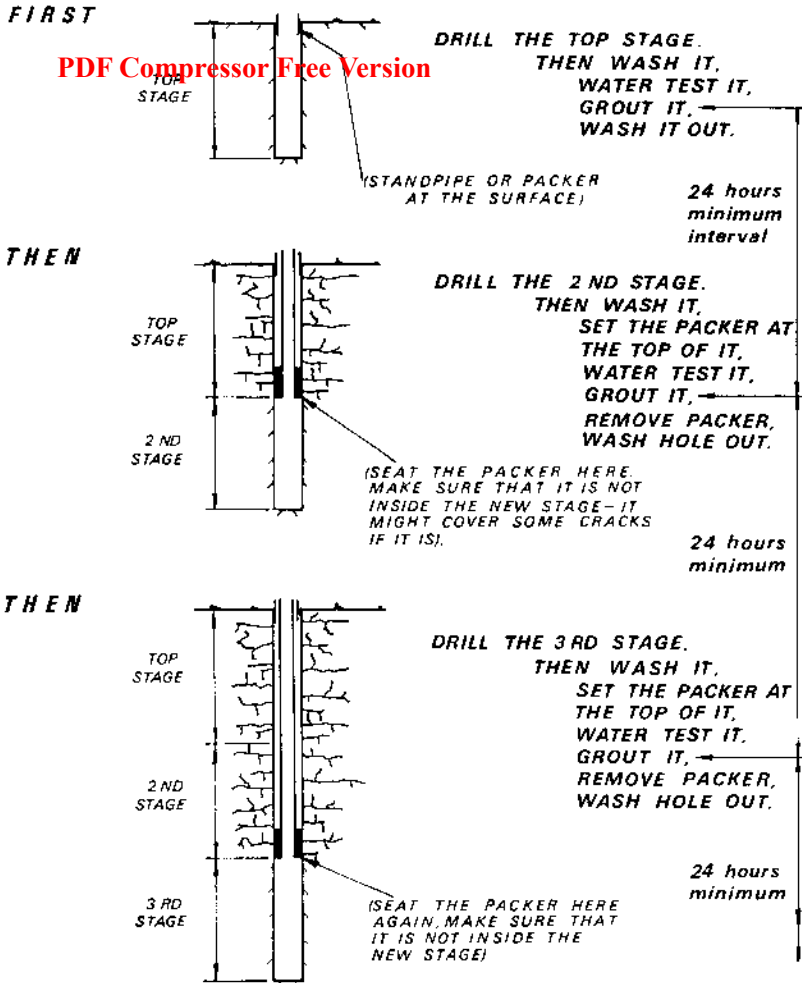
Grouting downstage with packer (Water Resources Commission 1981).
